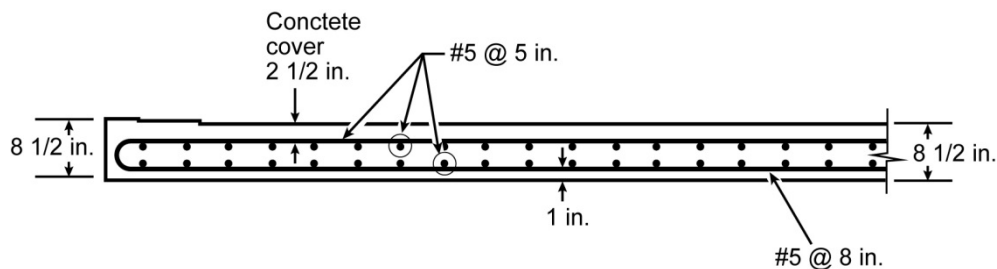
Typical Concrete Deck (Bridge) Reinforcement (AASHTO 2012)
